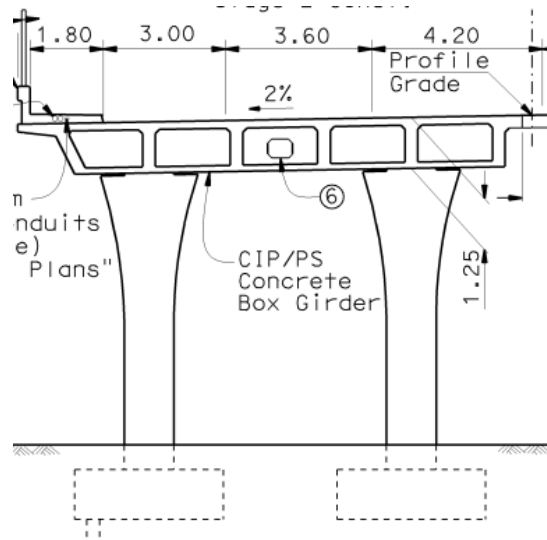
Cross-Section detail of Adobe bridge deck (Caltrans)
